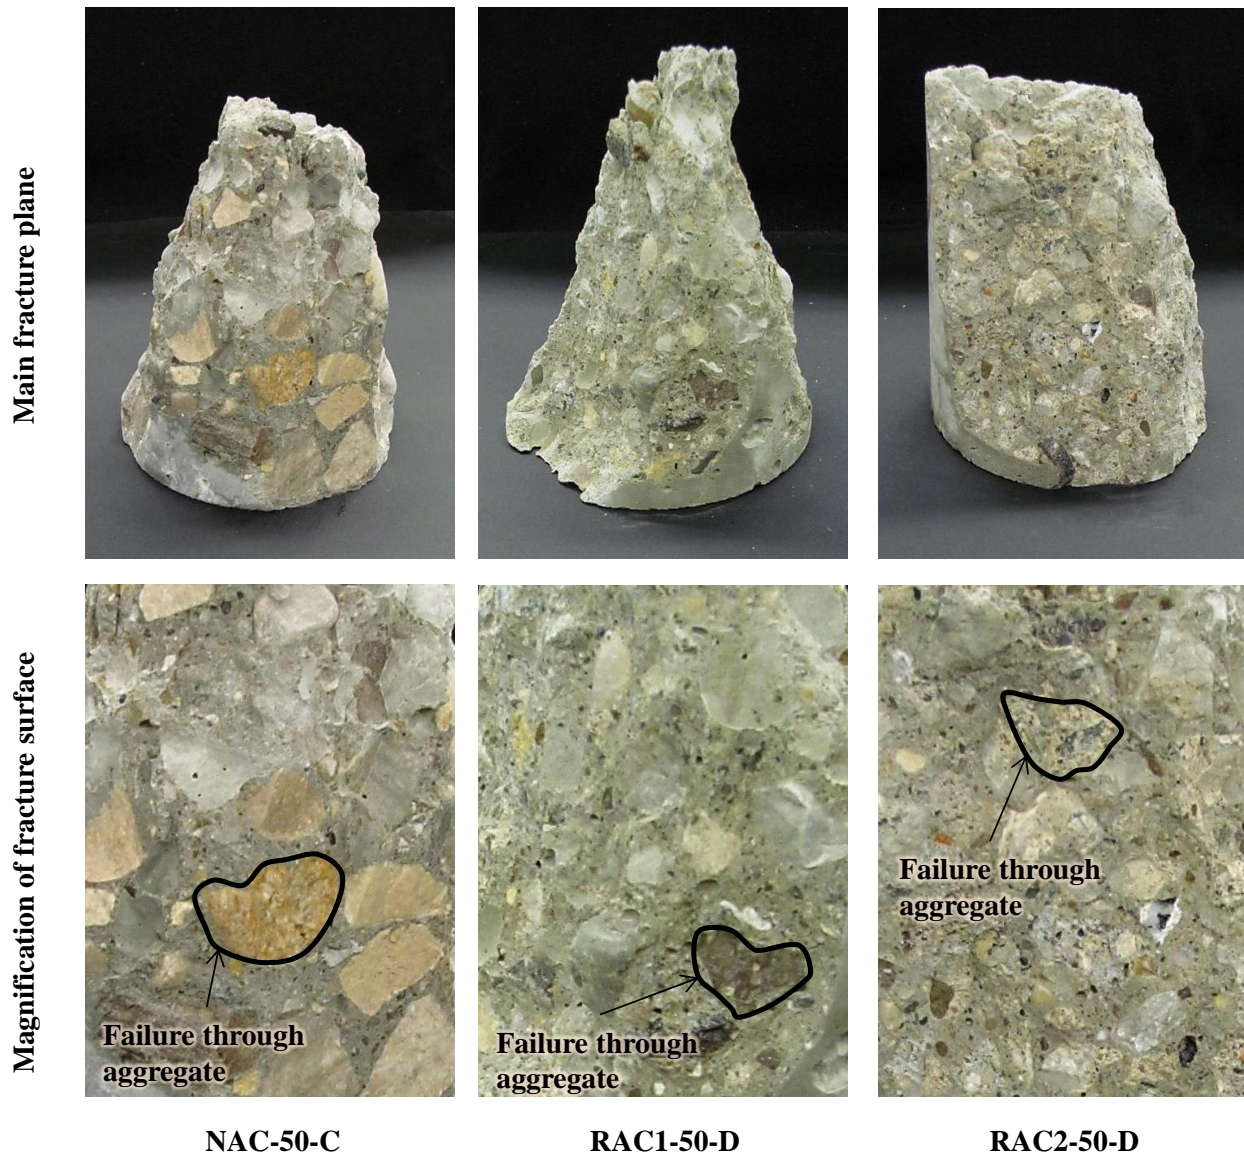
Fracture surfaces of the Phase 1 50 MPa direct replacement compressive strength specimens
